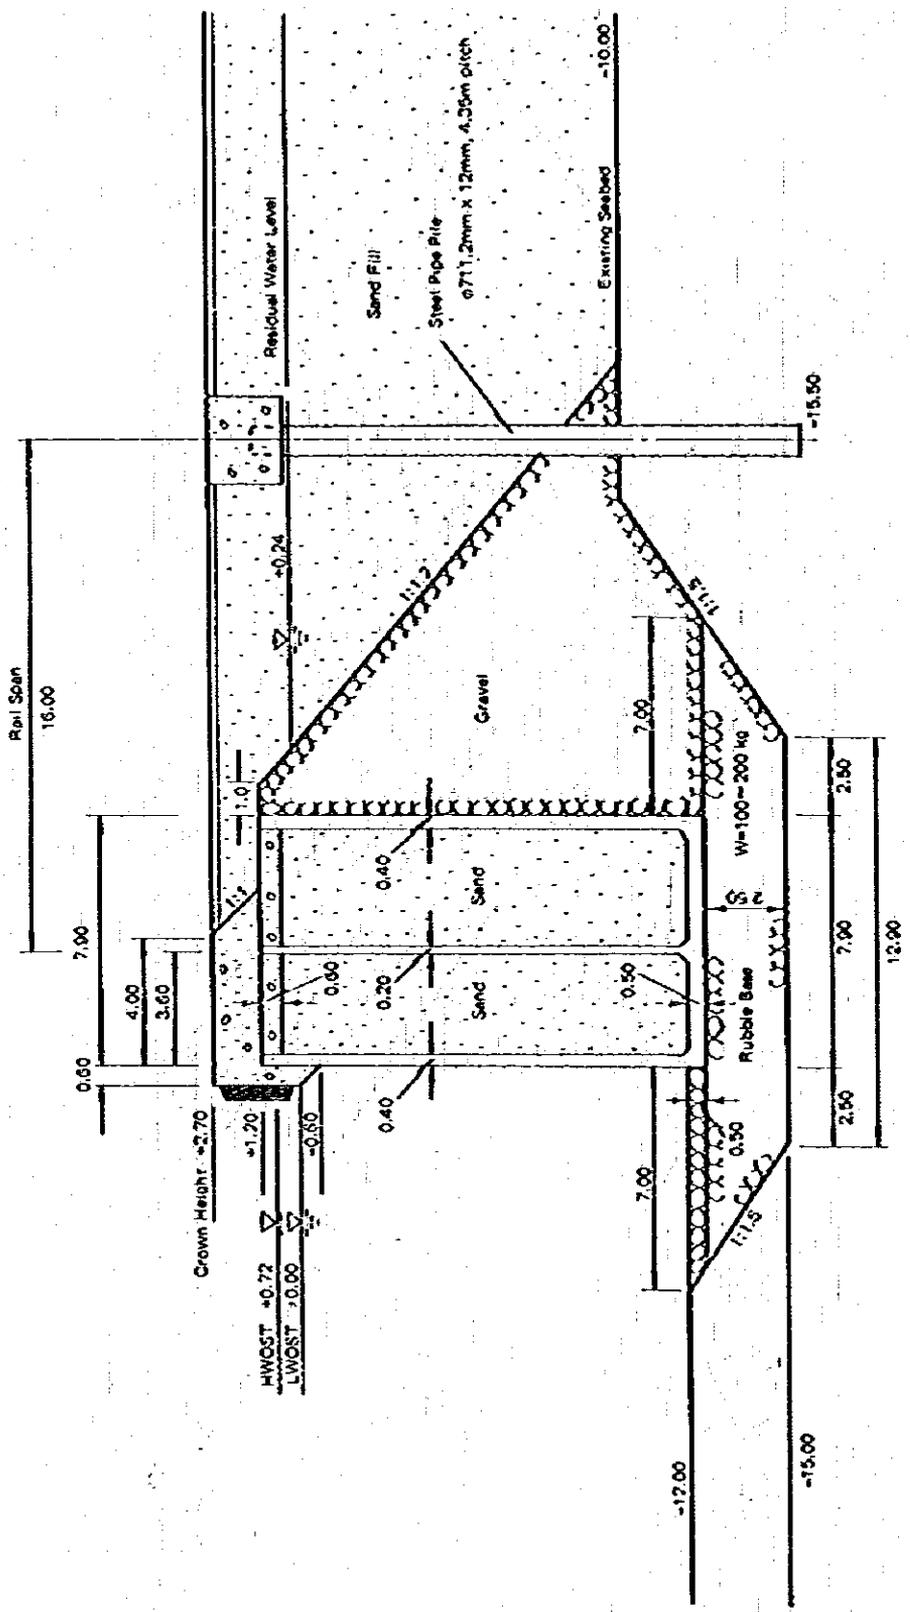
(a) Cross-Section of Gravity-Type Caisson Quaywall (Design C)
